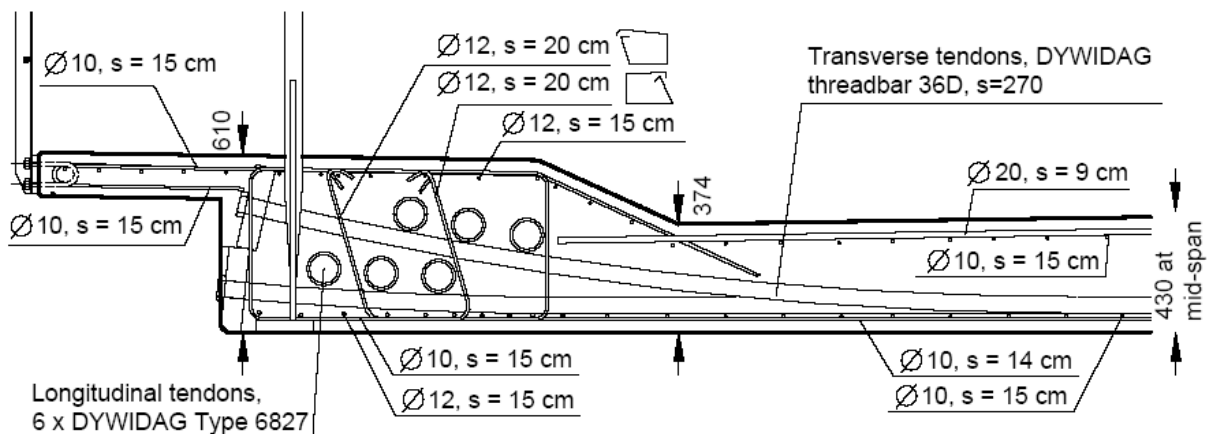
Reinforcement for a tie in the railway bridge in fig. 40e
